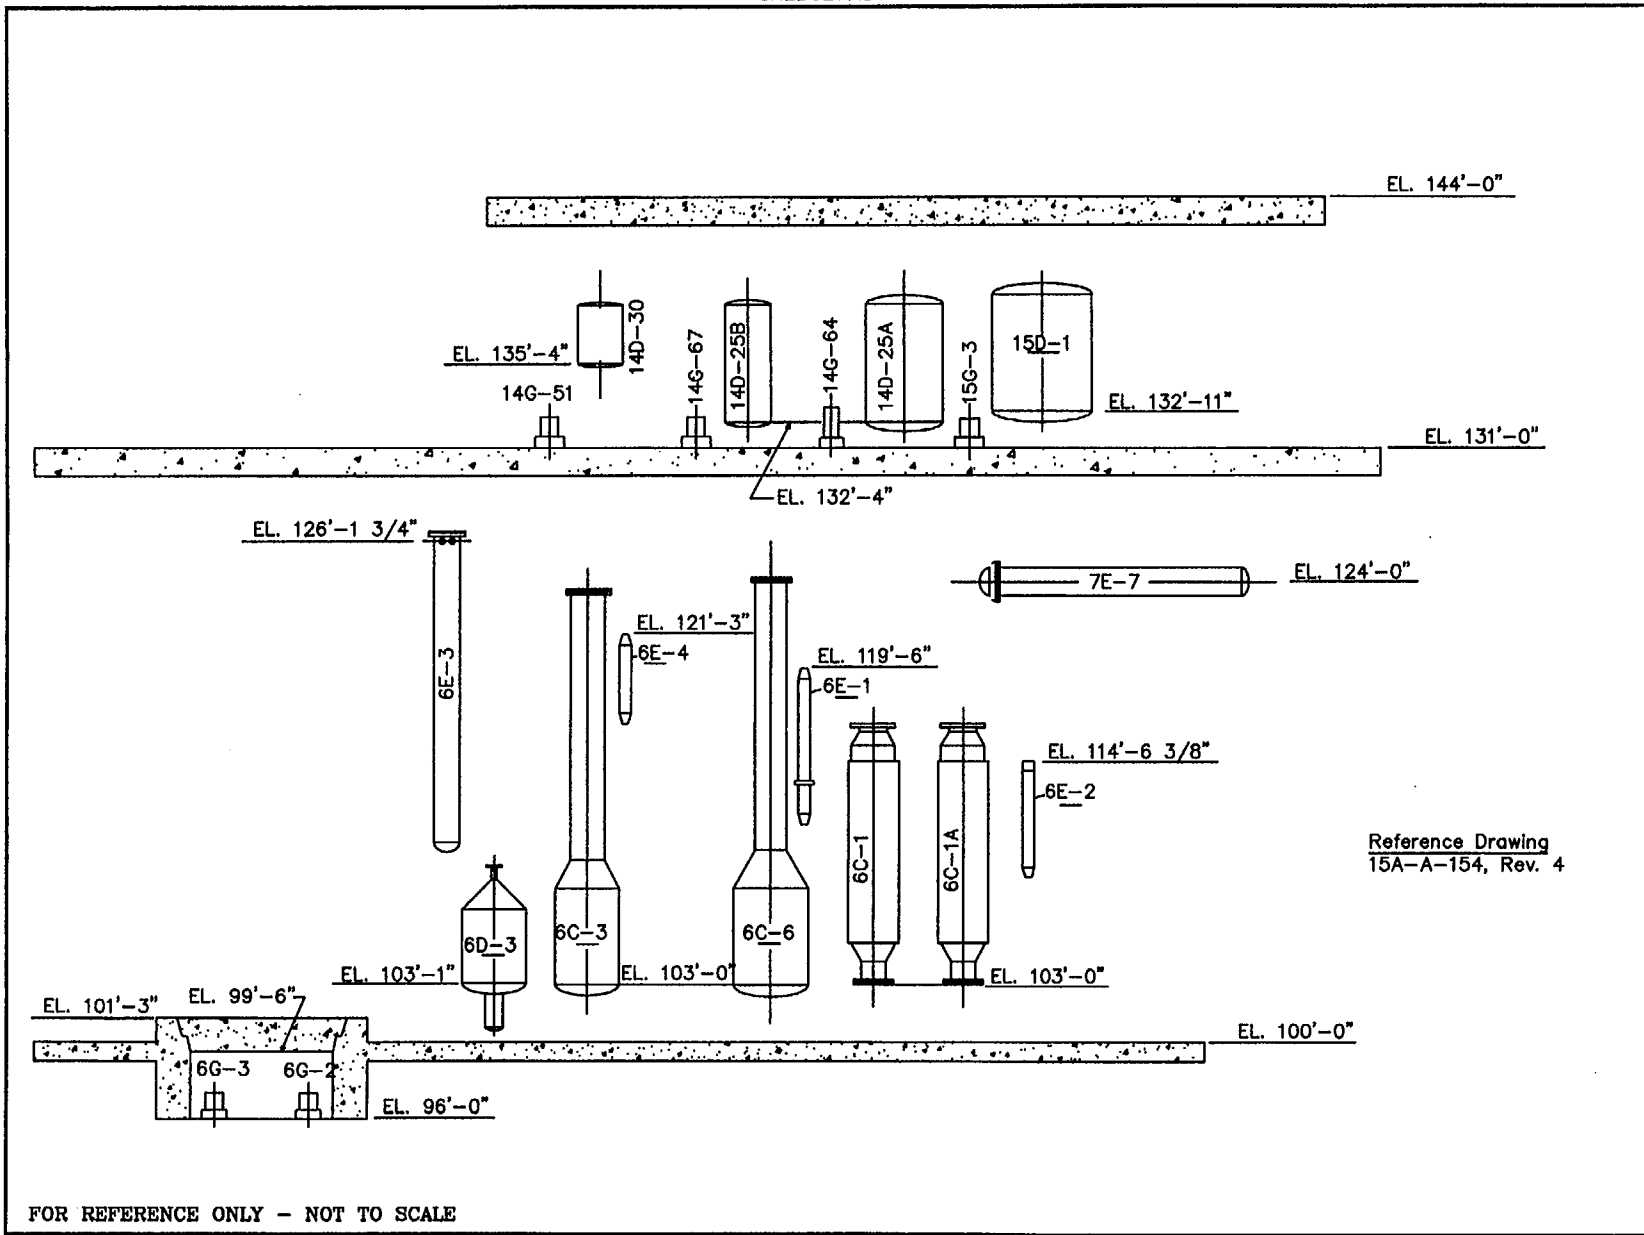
Equipment Arrangement – Off Gas Cell, Schematic Elevation
